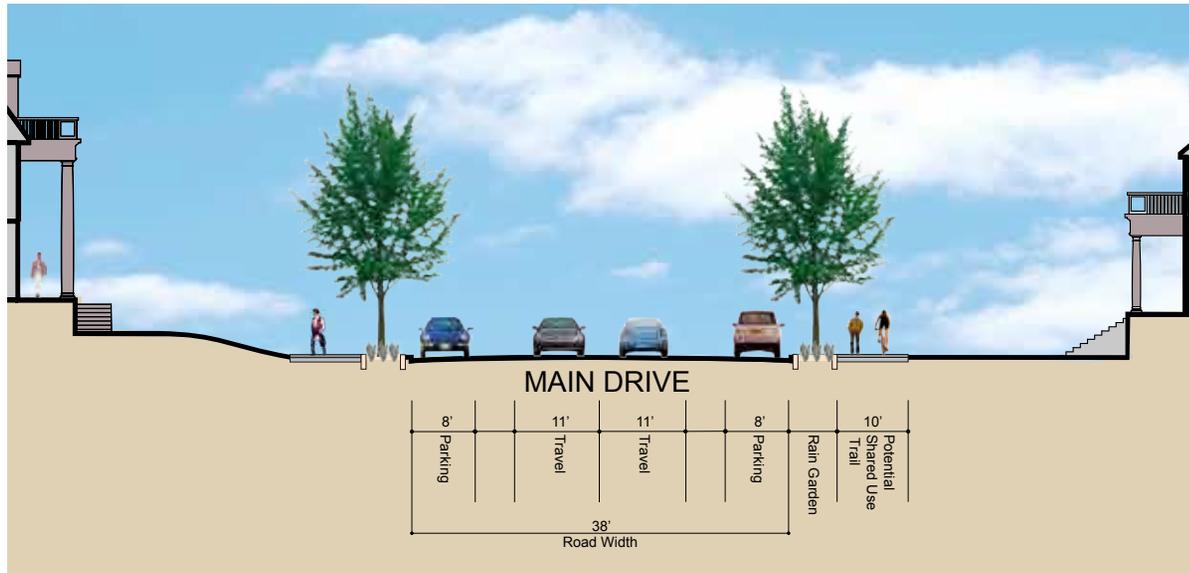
Sub-Area Plan 4. Source: Perkins+Will.
